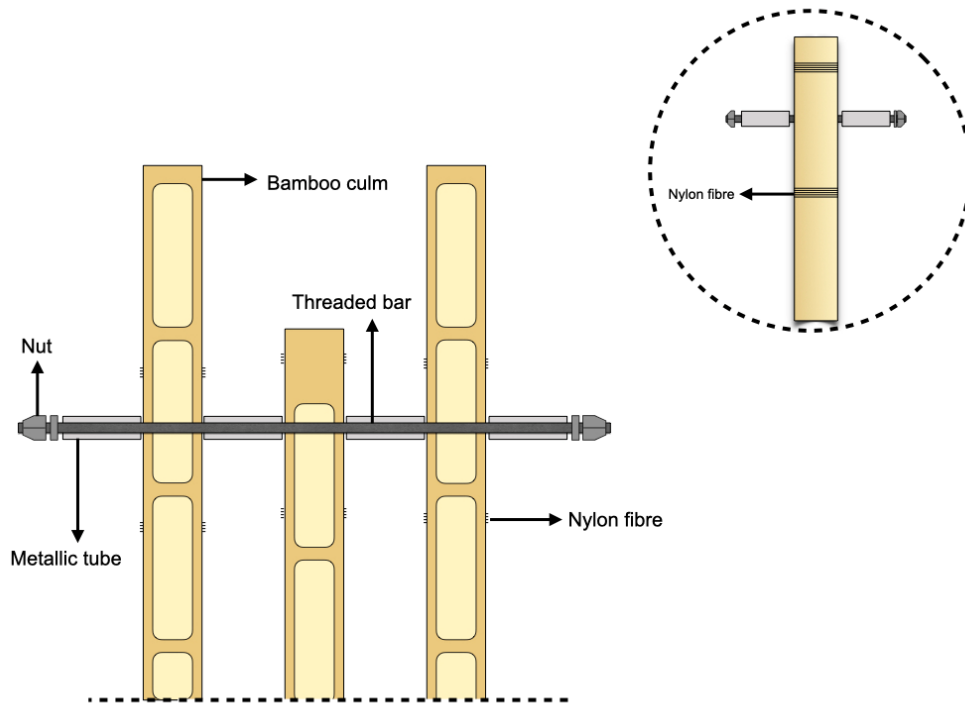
Detail of the connection between the wood beam and the bamboo culm.
